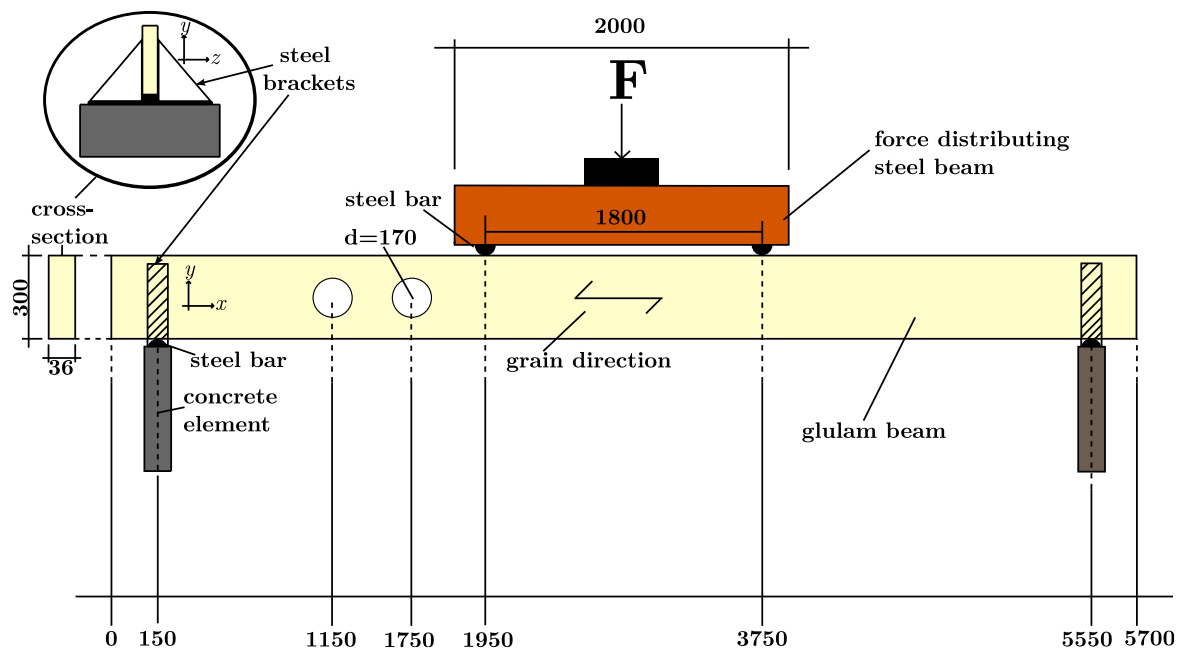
The applied test setup of glulam beams, subjected to a centered point-load, distributed by a steel beam. The supports consist of two concrete elements, each with a steel bracket.
